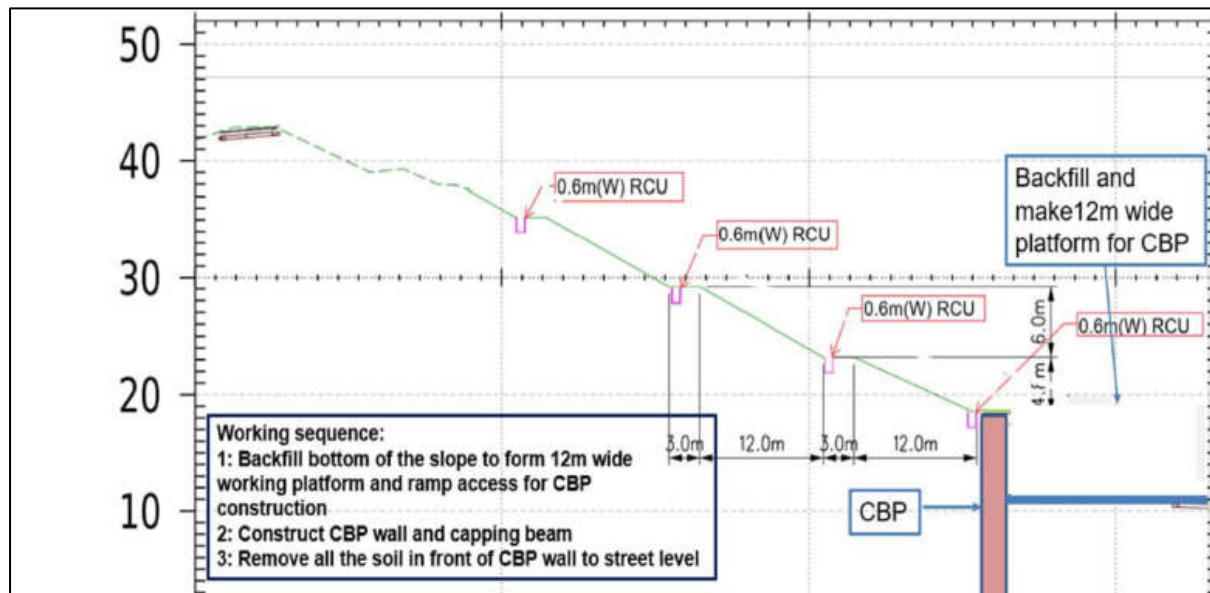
Elevation view of backfilling to existing Retaining wall to construct CBP wall
